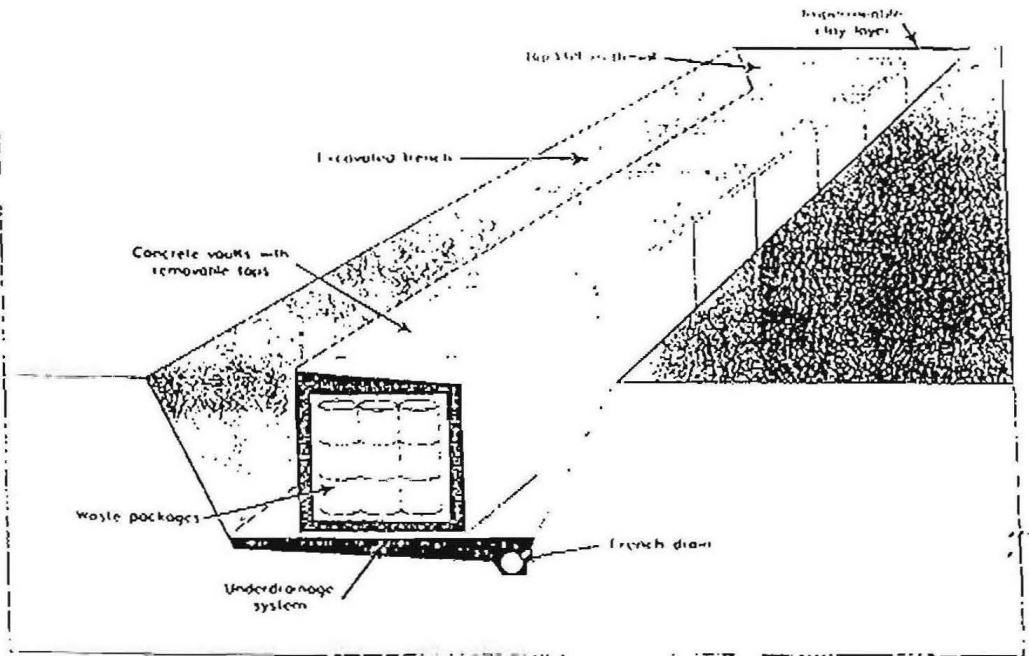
Below-Ground Vault Disposal Facility⁶³
